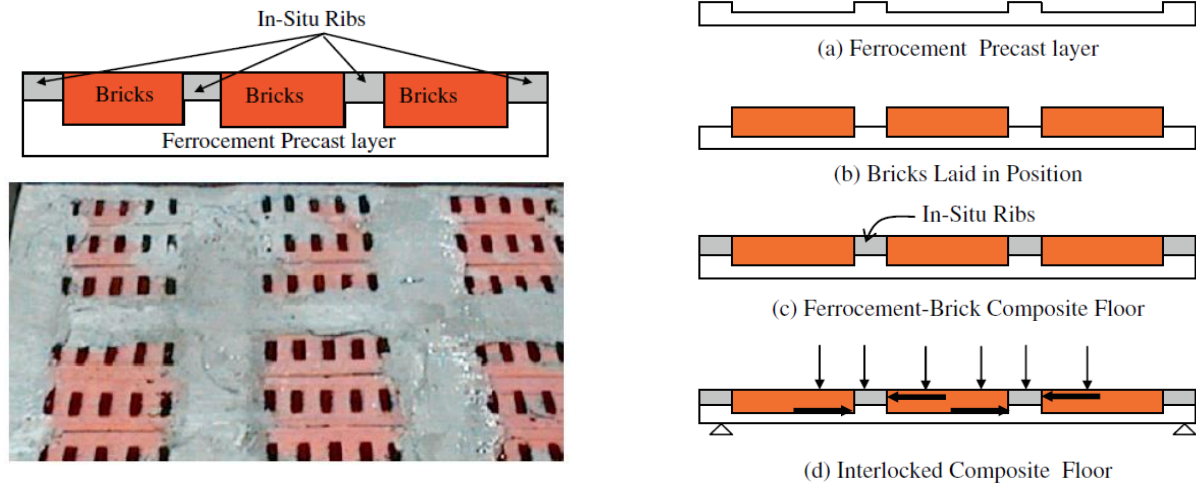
Interlocking composite ferrocement–brick floor slab
